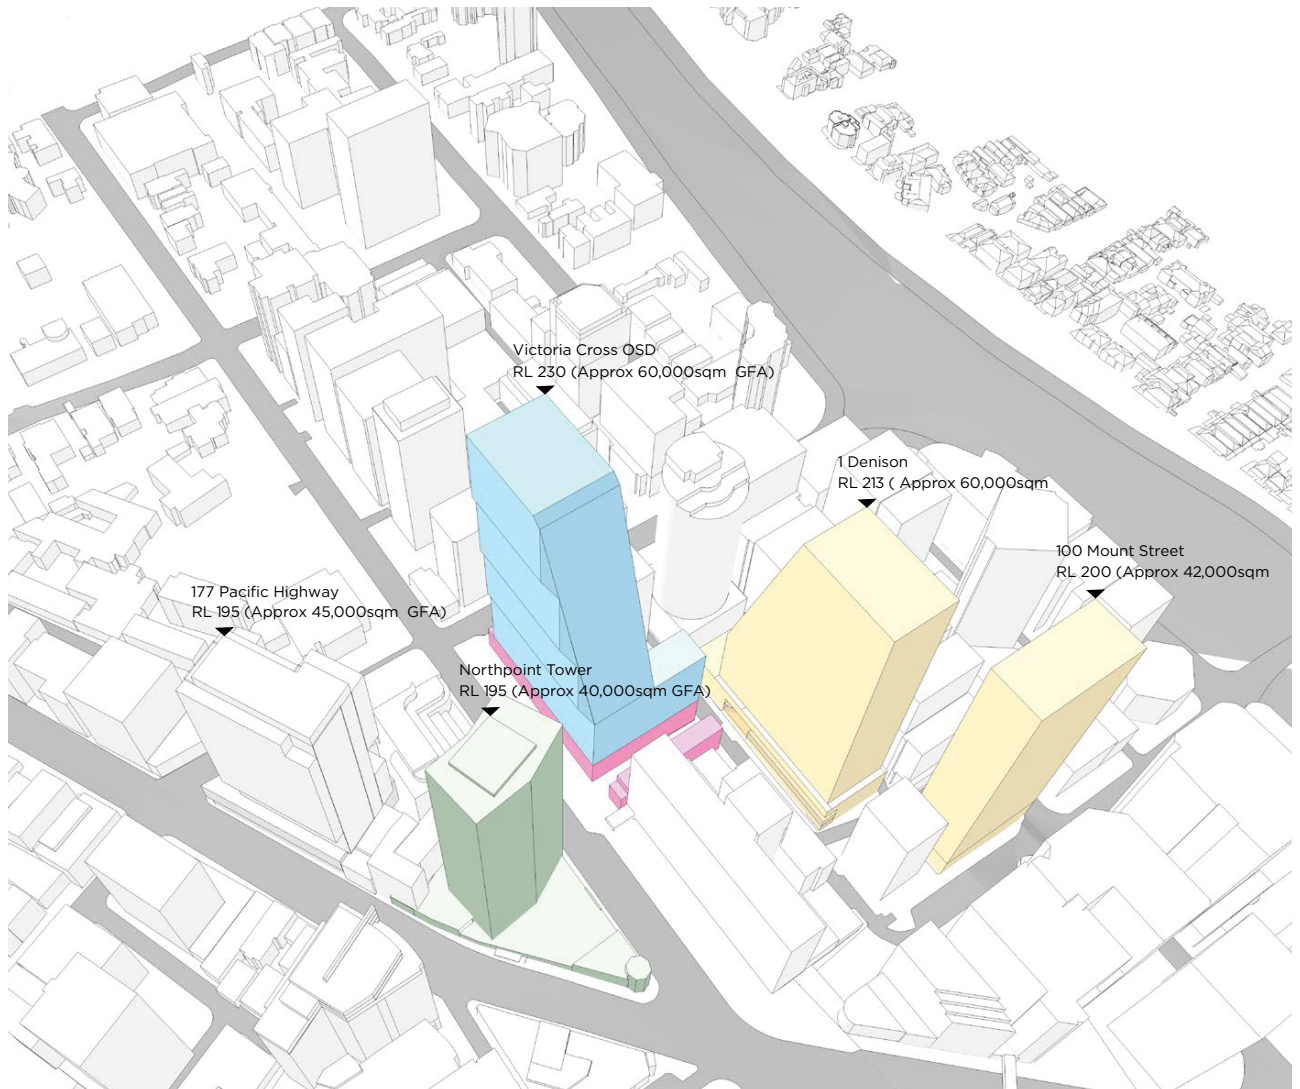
Axonometric diagram of the proposed building envelope from southwest
